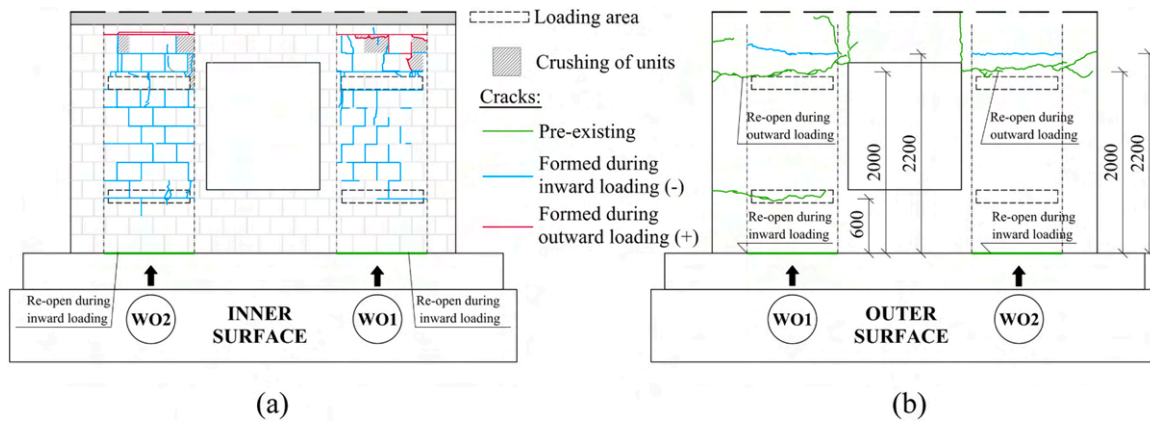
Ultimate crack patterns detected on both the (a) inner and the (b) outer surface of the wall WO1 and WO2 (dimensions in [mm]).
